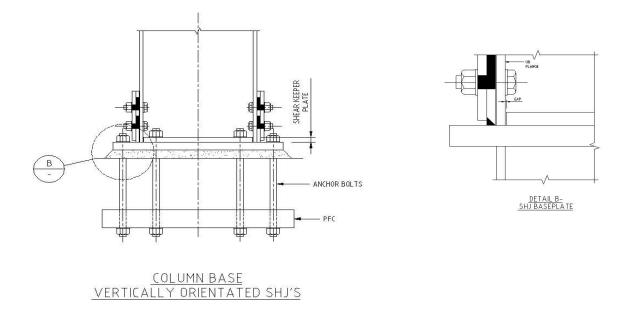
Vertical Orientated SHJ for Column Hinge Protection in MRF's and Detail B Cantilever Flange SHJ Friction Plates
